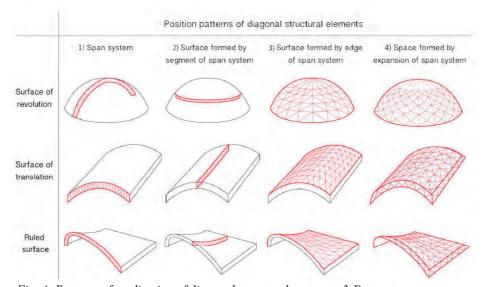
Patterns of application of diagonal structural system to 3-D structure
